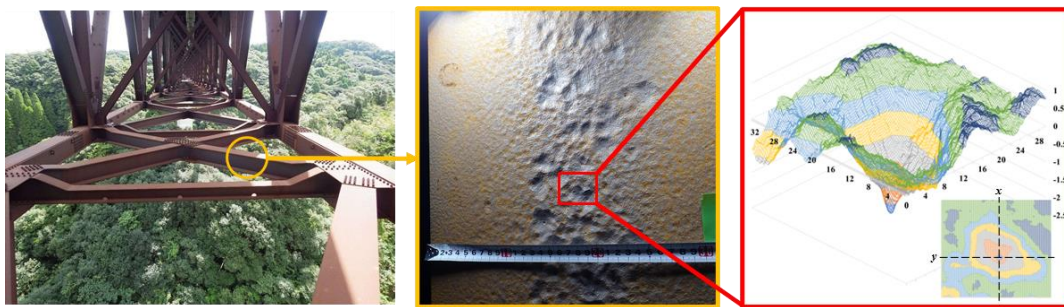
Severe corrosion pits on weathering steel flange
